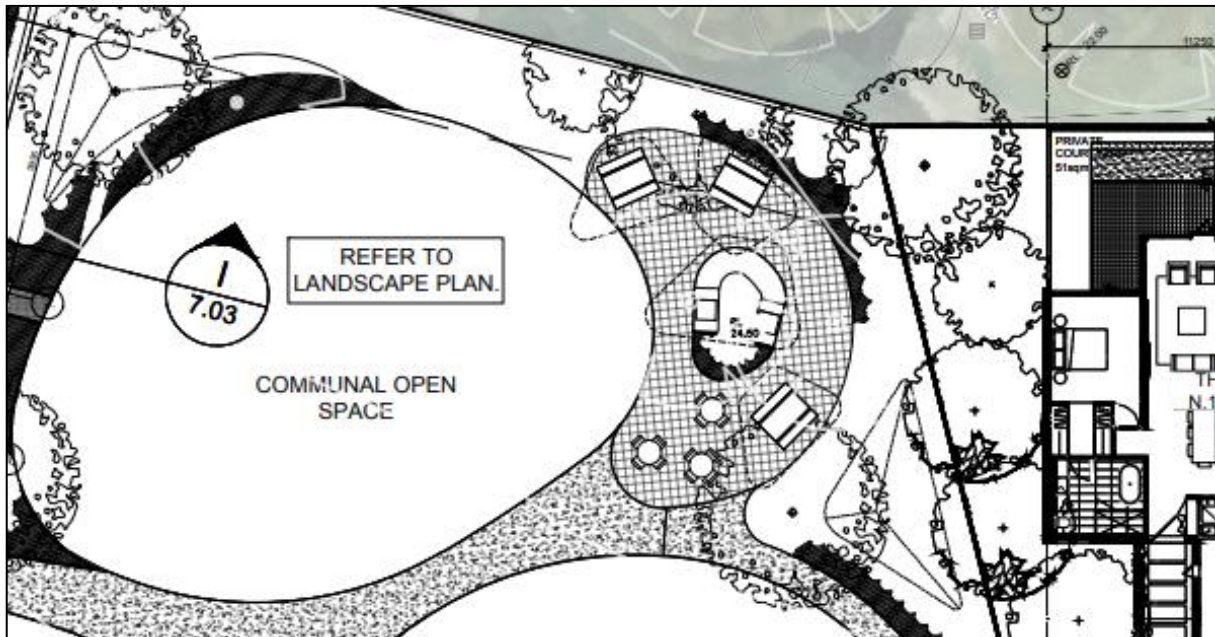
Floor Plan of pergola as depicted on the site plan approved under DA2015/100.
